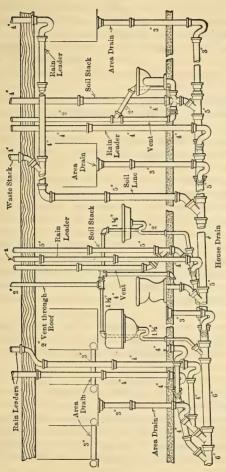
Another View of the Plumbing in the Basement of the Hibbs' Building.
